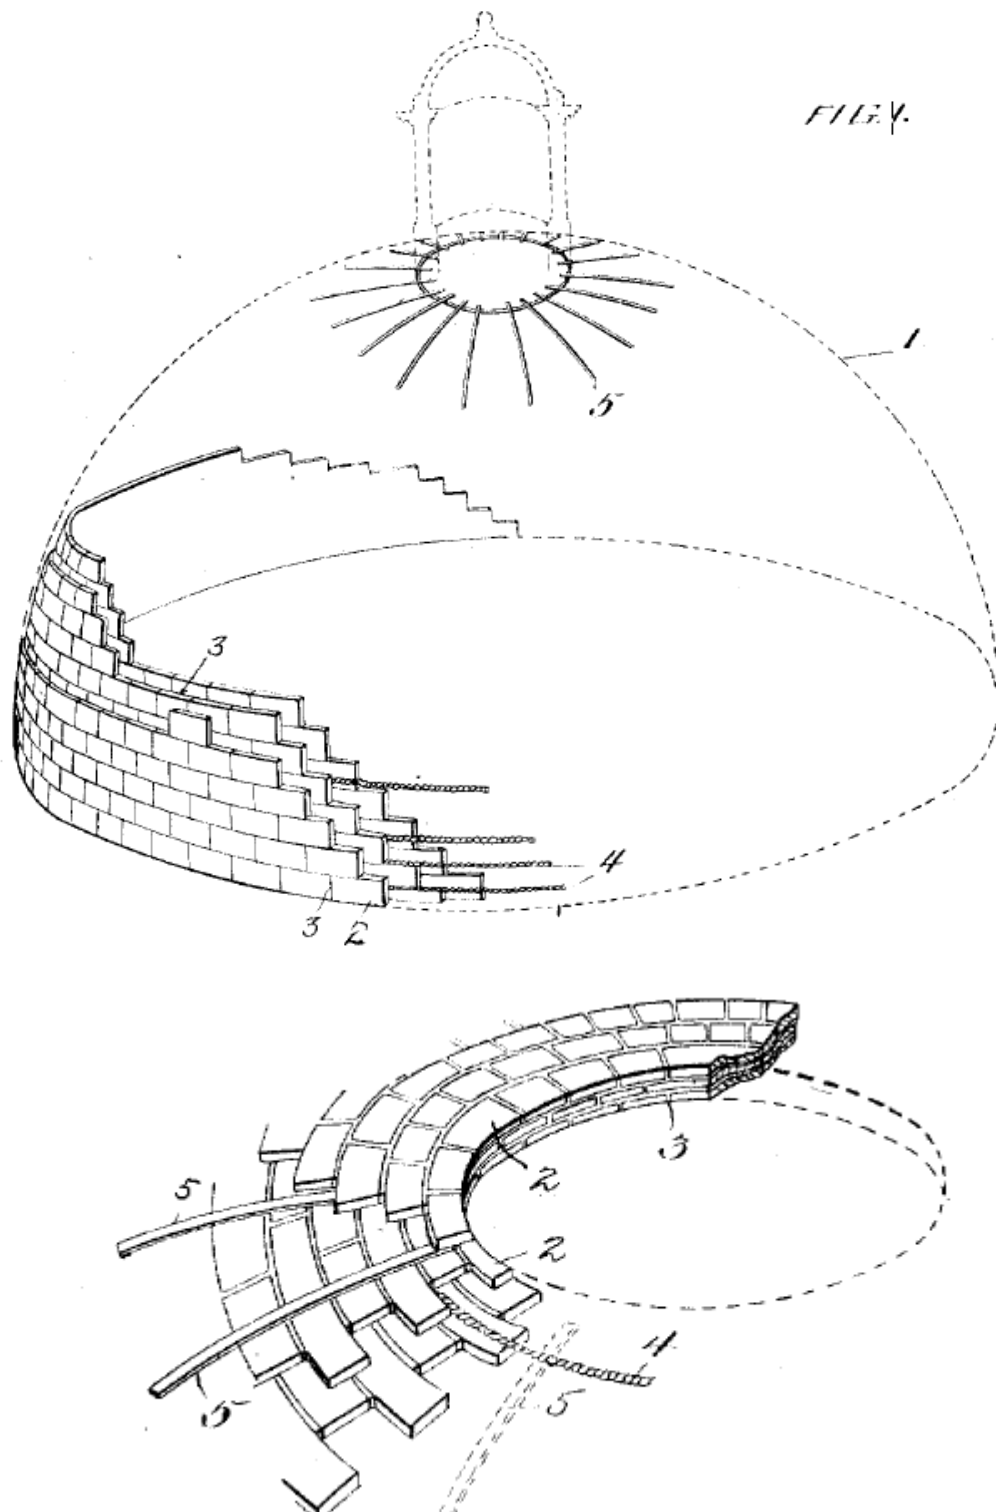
Guastavino Jr. reinforced timbrel dome (United States Patent office)
